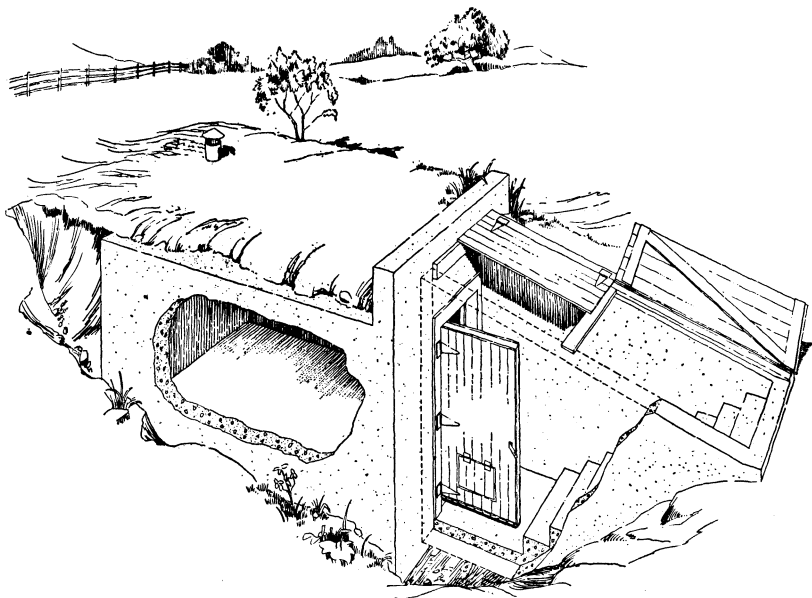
A 300-bushel earth-covered concrete potato storage. Exchange Plan No. 5176.
